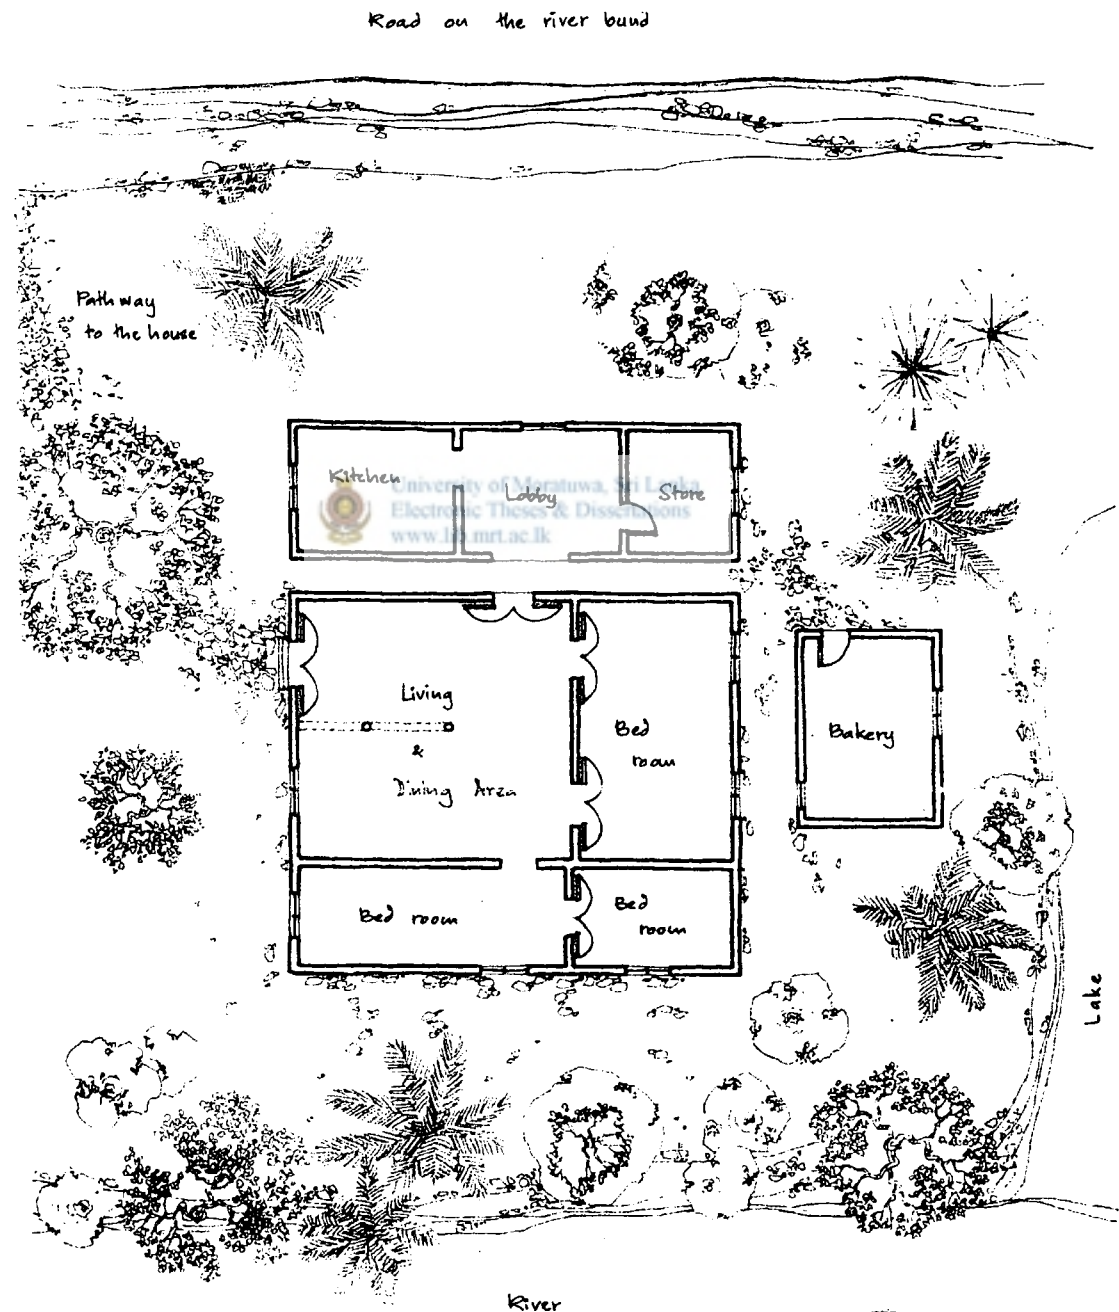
Plan & elevation of the pre-disaster house of H.S.B. Wijethilake
